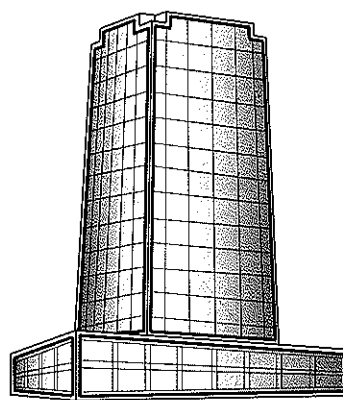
Building with open ground storey (Source: [www.nicee.org](http://www.nicee.org))
